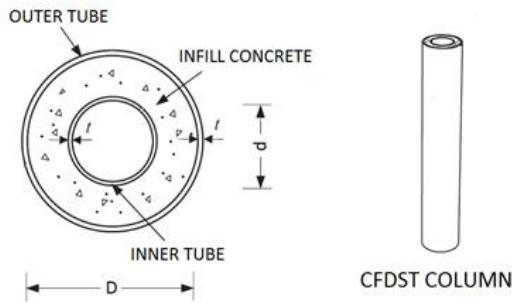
A typical CFDST column and its cross section (Li et al., 2012)
